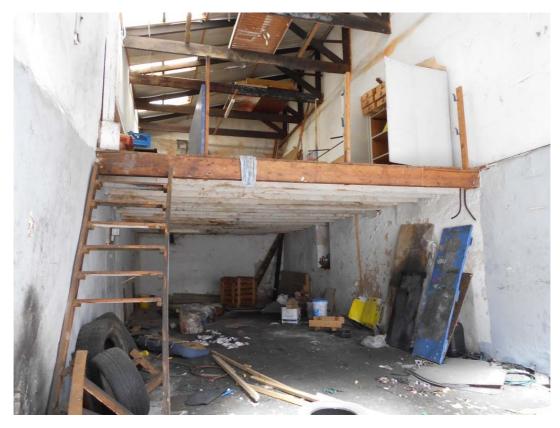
Internal view of narrow portion of Danny's Auto. Wall on right side is shared with Mohidien family and the barber. Wall on far end is shared with Atlas Trading. Wall on the left hand side is internal to Danny's Auto.
